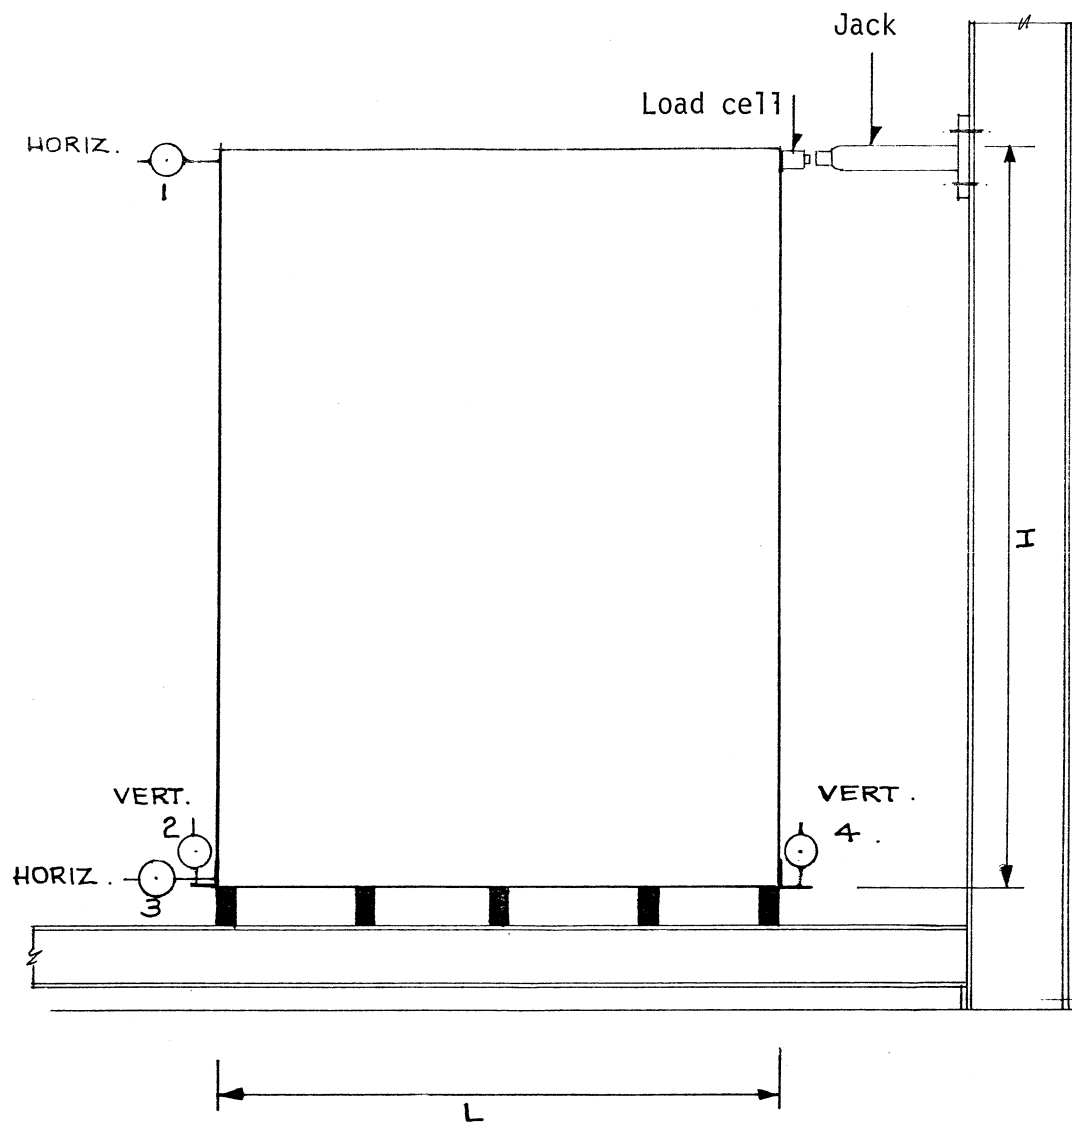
Positions at which Deflections Should be Measured During Racking Tests on Walls
